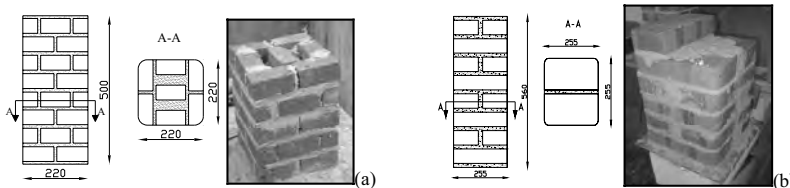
Specimen details (dimensions in mm): (a) tuff masonry; (b) clay brick masonry.
